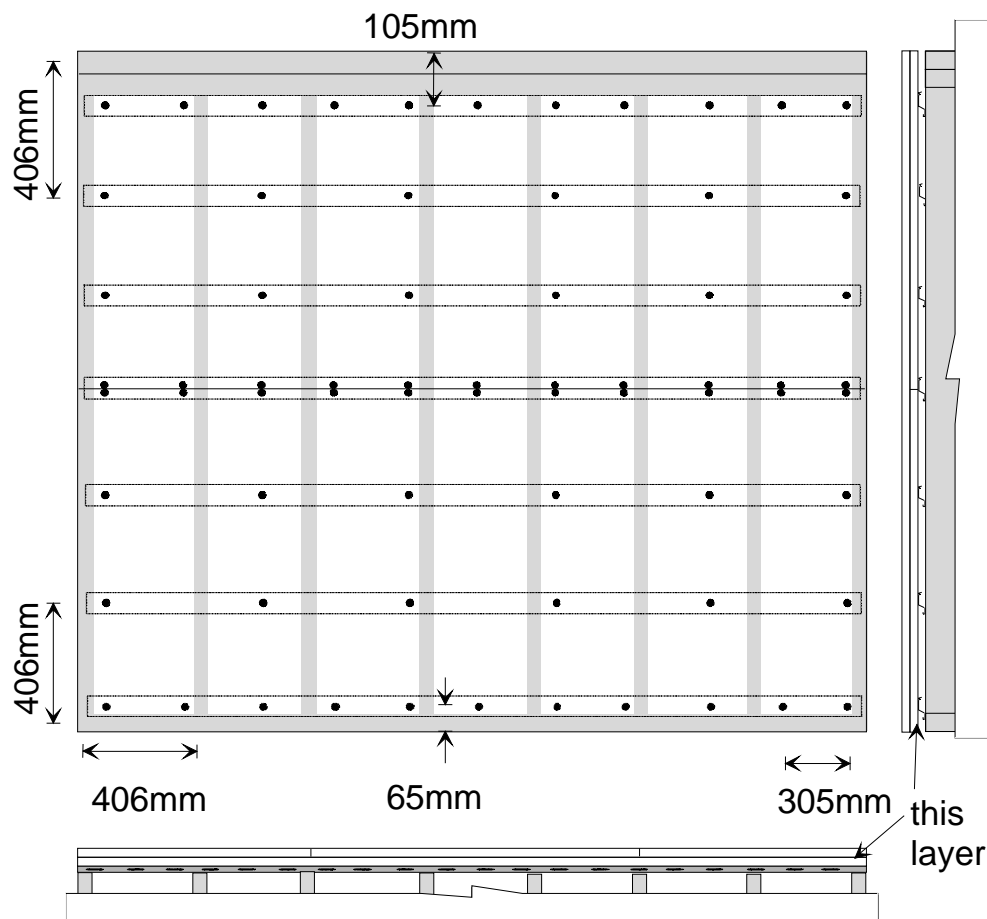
Base-ply of two-ply gypsum board attached parallel to resilient furring channels. Resilient channels attached perpendicular to studs at 406 mm o.c.. Studs at 406 mm o.c., double plate at top, single plate at bottom. Meets requirements of CAN/CSA-A82.31-M91, Clause 12.2.3.2. Note that screw spacing was shifted from ideal locations to avoid contact with studs. Drawing not to scale.
